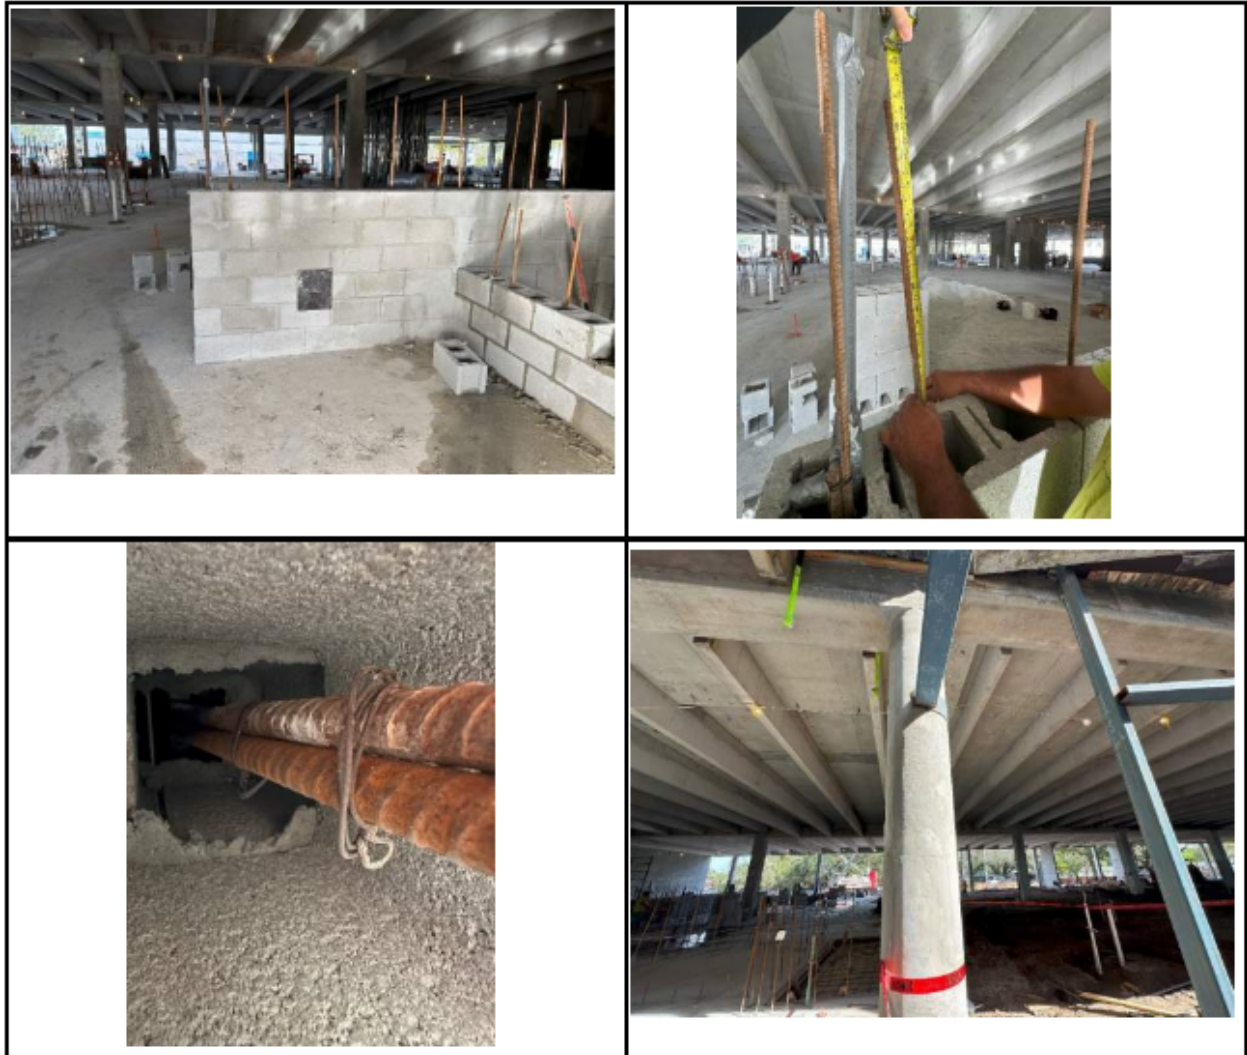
Photographs from Threshold Inspection Report No. 084. Upper photographs and lower right photograph appear to be of the first story prior to full installation of CMU walls. Note the lack of shoring indicating that the CMU walls were not constructed as bearing walls
